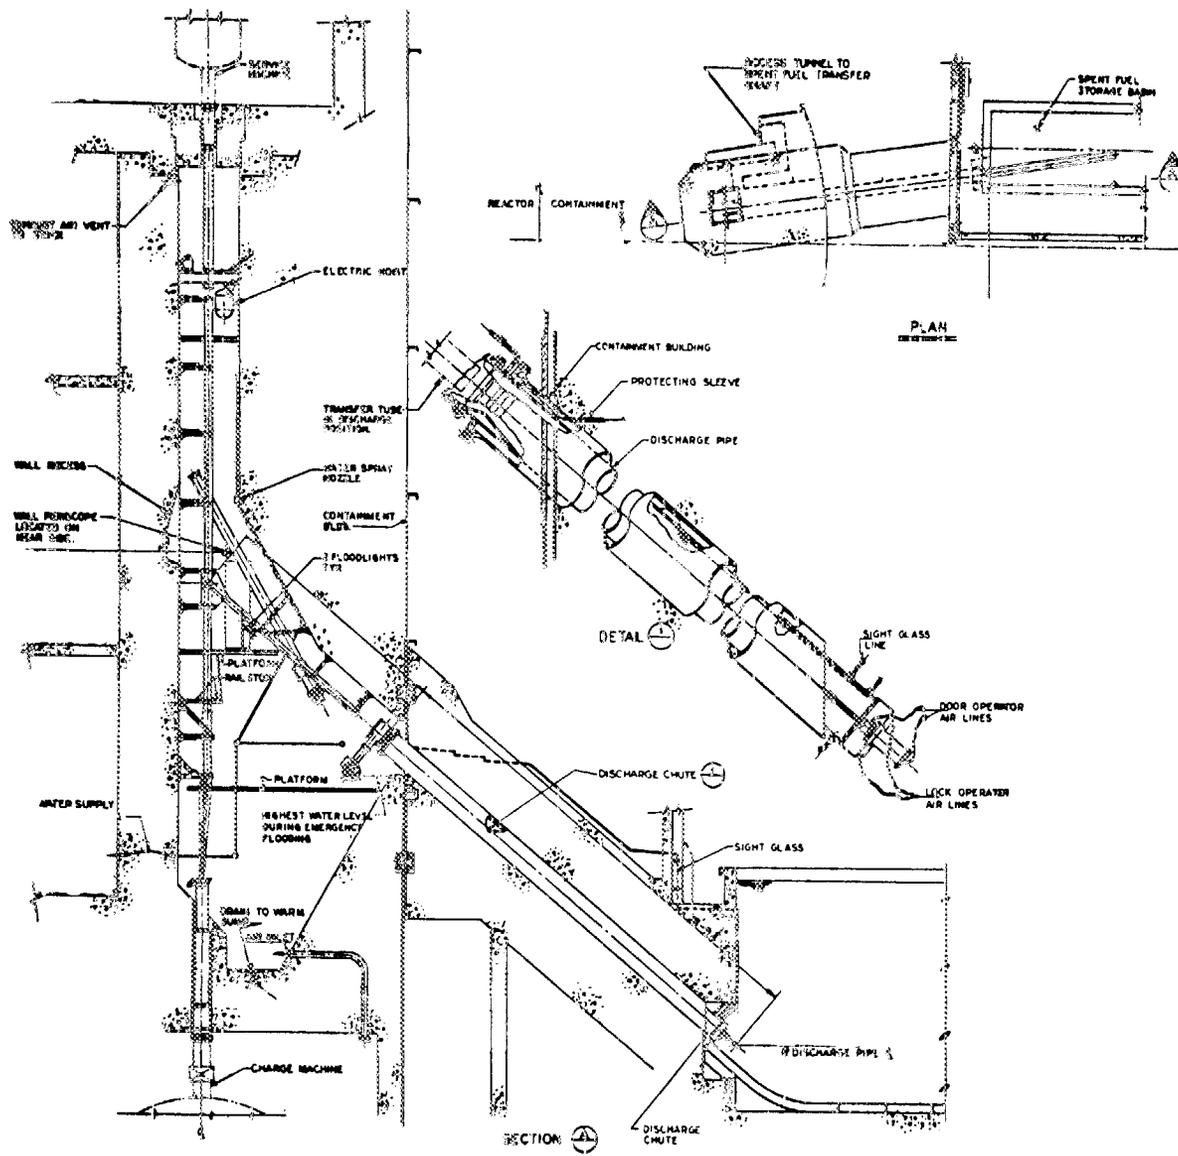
EGCR Spent Fuel Transfer Mechanism.
